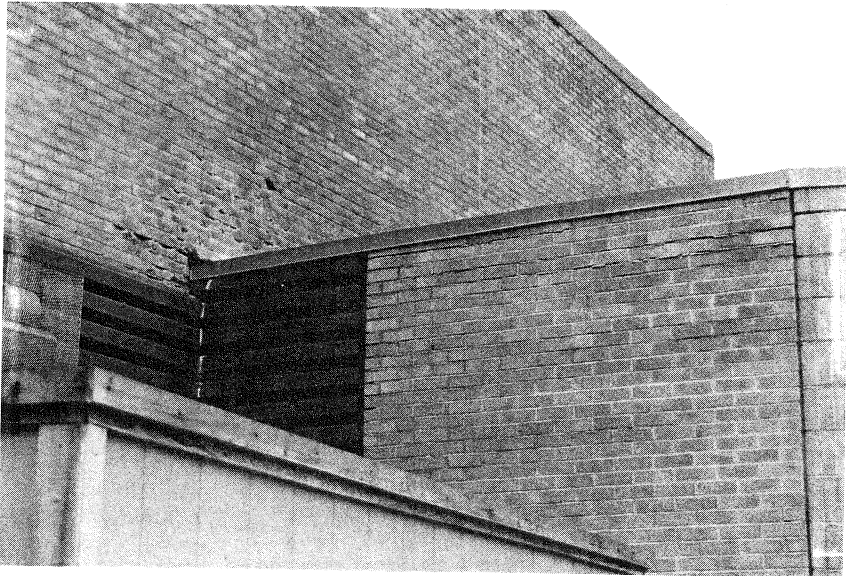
Brick Spalling Junction of Whirlpool with Main Roof
